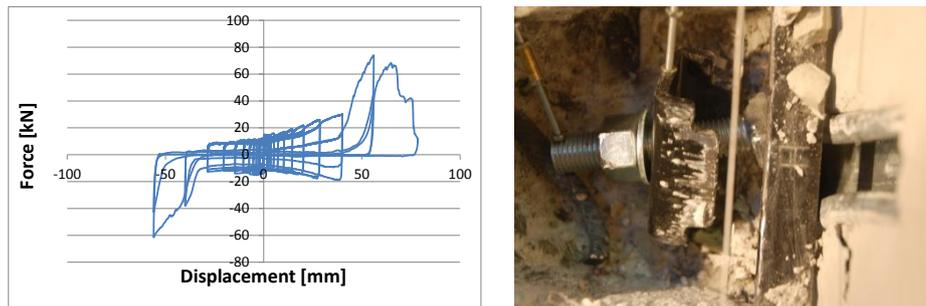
Typical response of cantilever connections (a pair of connection was tested)
